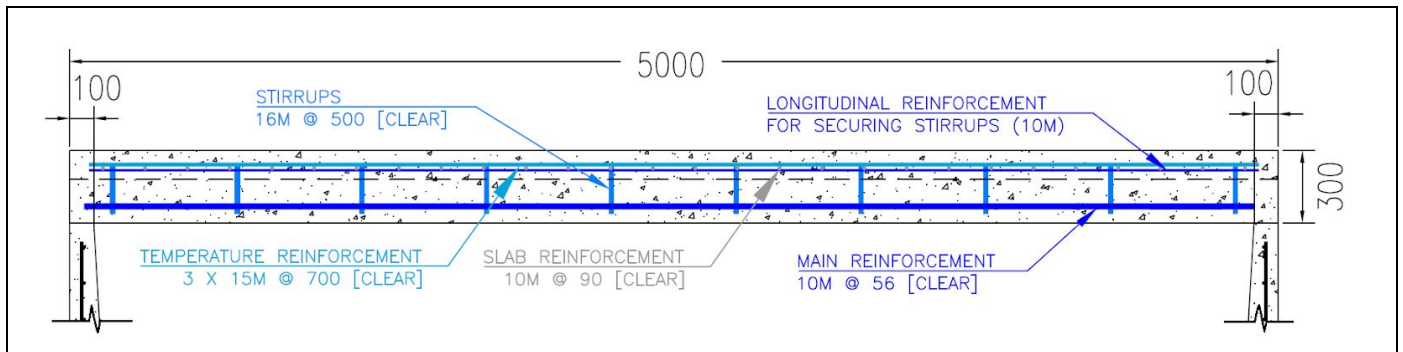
Underpass Detail - Top Slab Cross-Section (North-South)
